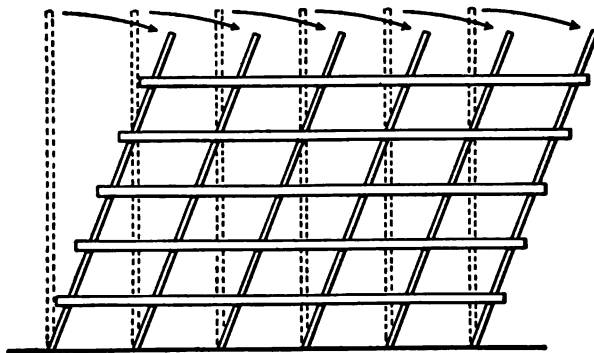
FAILURE BY COLLAPSING PARALLEL TO THE WALL.
